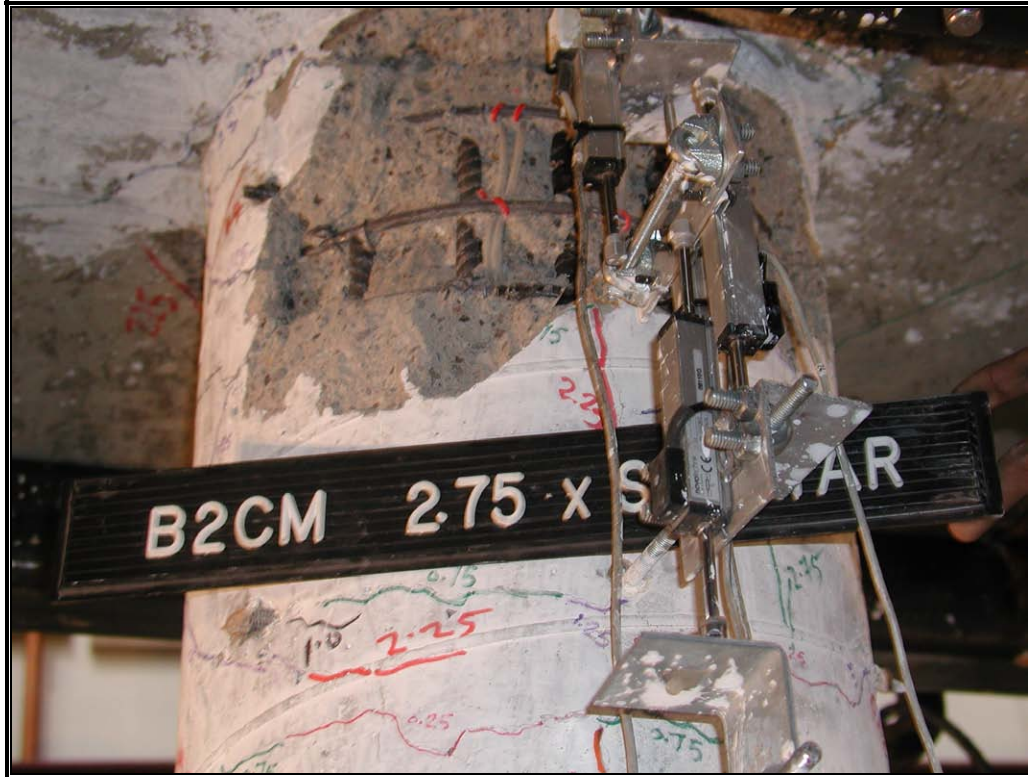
Concrete Spalling on East Side of West Column
